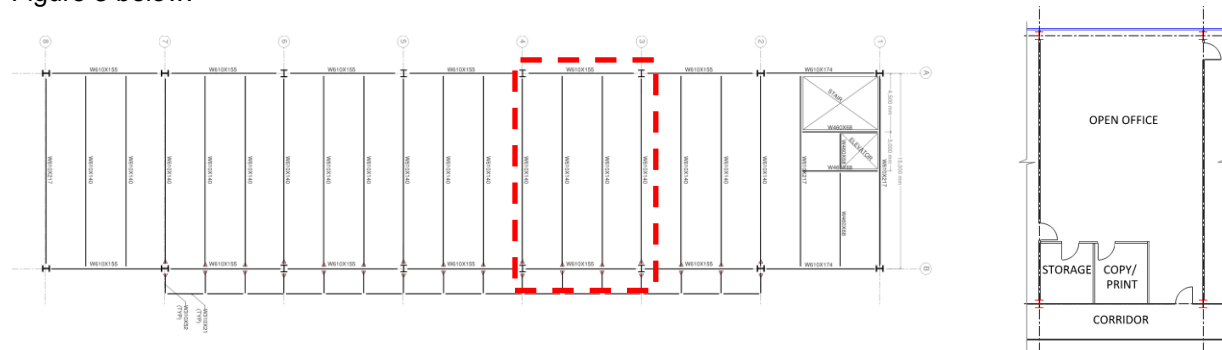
Structural plan of building floor (left) and architectural plan of study compartment (right)
